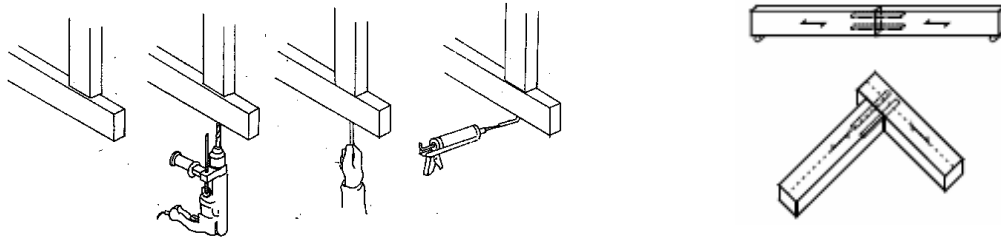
Schematic strengthening of connections, assuring structural continuity by insertion of FRP or steel bras bonded with epoxy resin.
